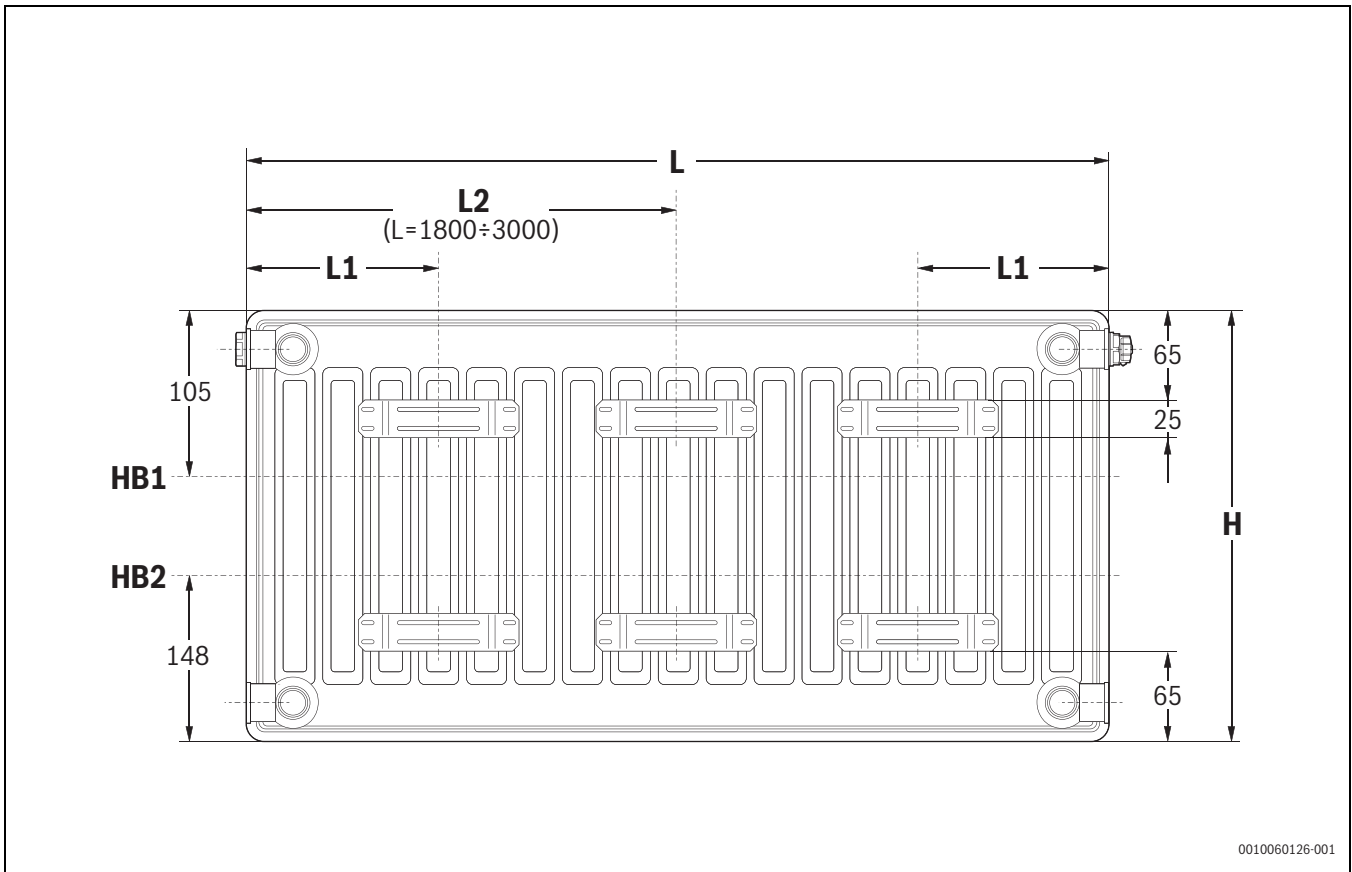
Rear view of the Type 11, 20, 30 for C-, VC-, VCM-, and A-Profil/ Plan.2 radiators
